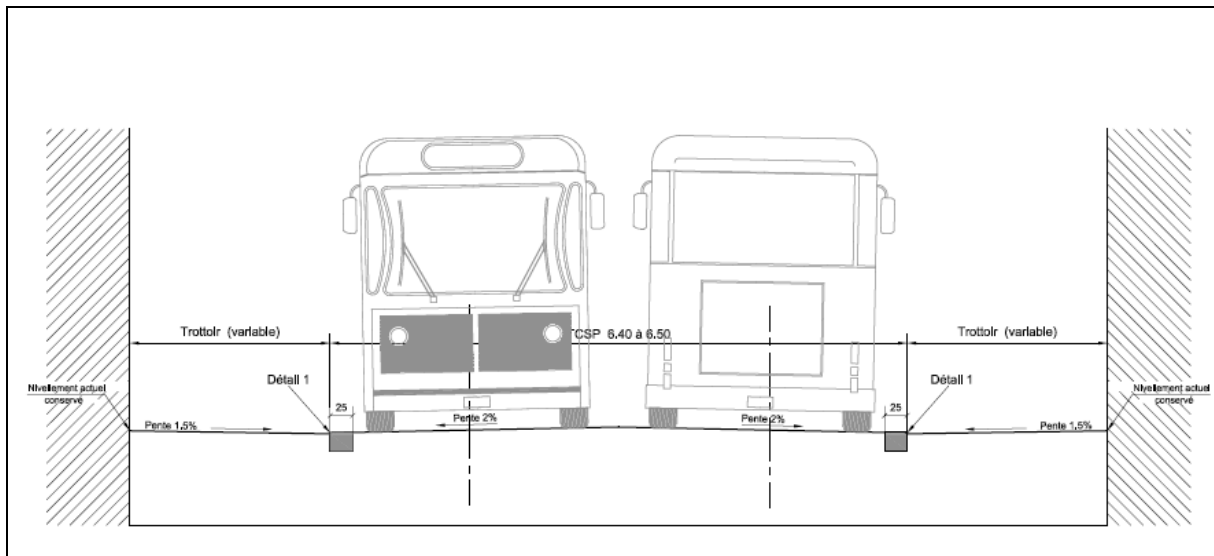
Section type n°6 the transit right of way and a 2 ways road
